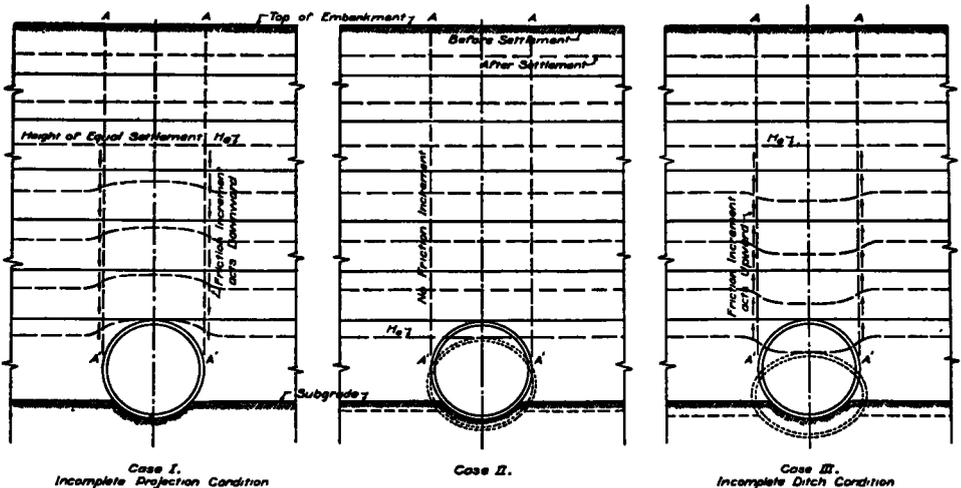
Typical Settlement Conditions Affecting Loads on Culverts
